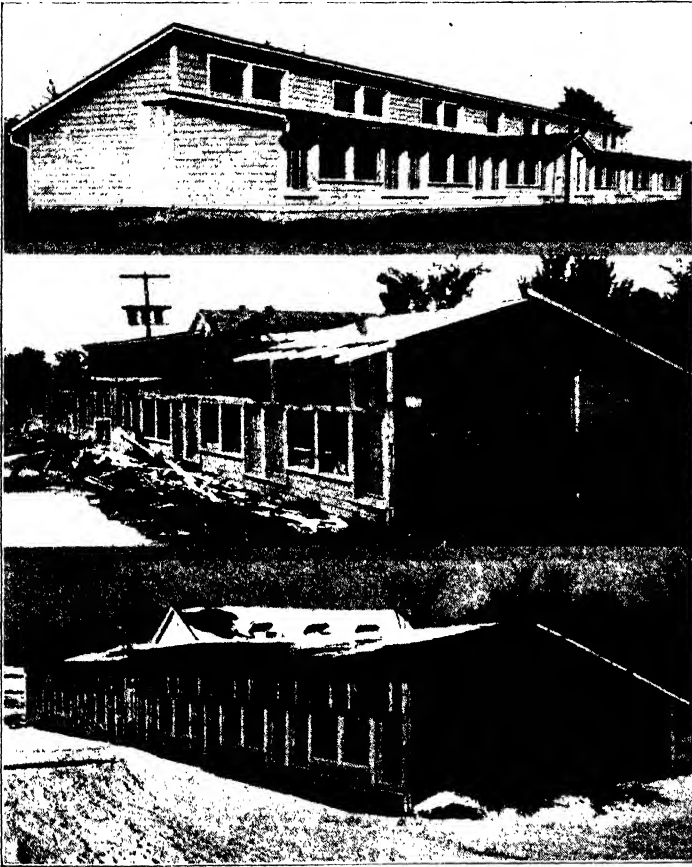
The Station semi-monitor poultry house before remodeling (top). Elevating the front roof span (middle). The remodeled house showing additional windows in upper front (bottom).
